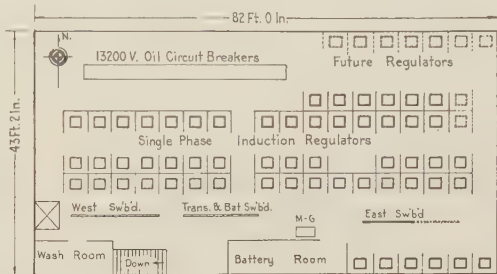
SECOND FLOOR PLAN OF AUTOMATIC SUBSTATION “E”, KANSAS CITY POWER & LIGHT CO.
